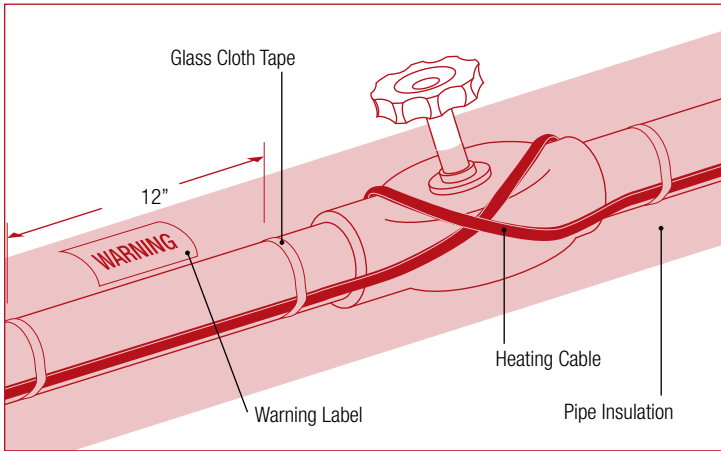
Pipe Freeze Protection Installation Overview
